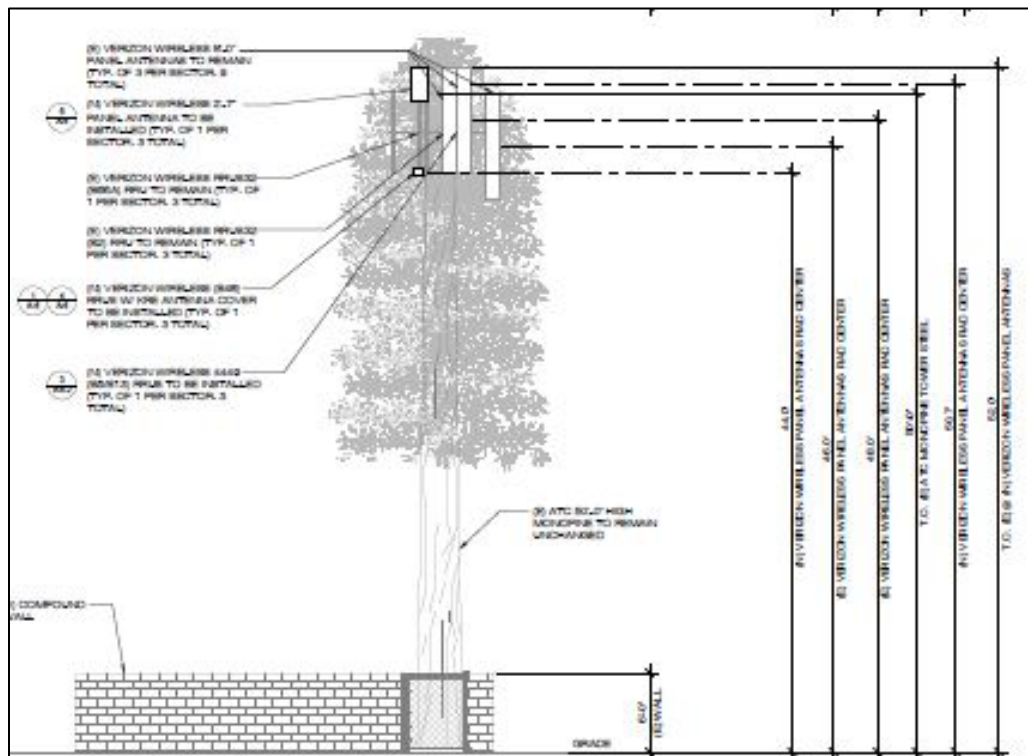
Elevation view of proposed modifications to Pole and view of equipment enclosure (Source: Plans, page A-4).
